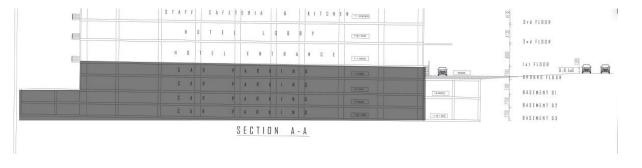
Sectional View of the Basement and Ground Floor Car Parking Floors
